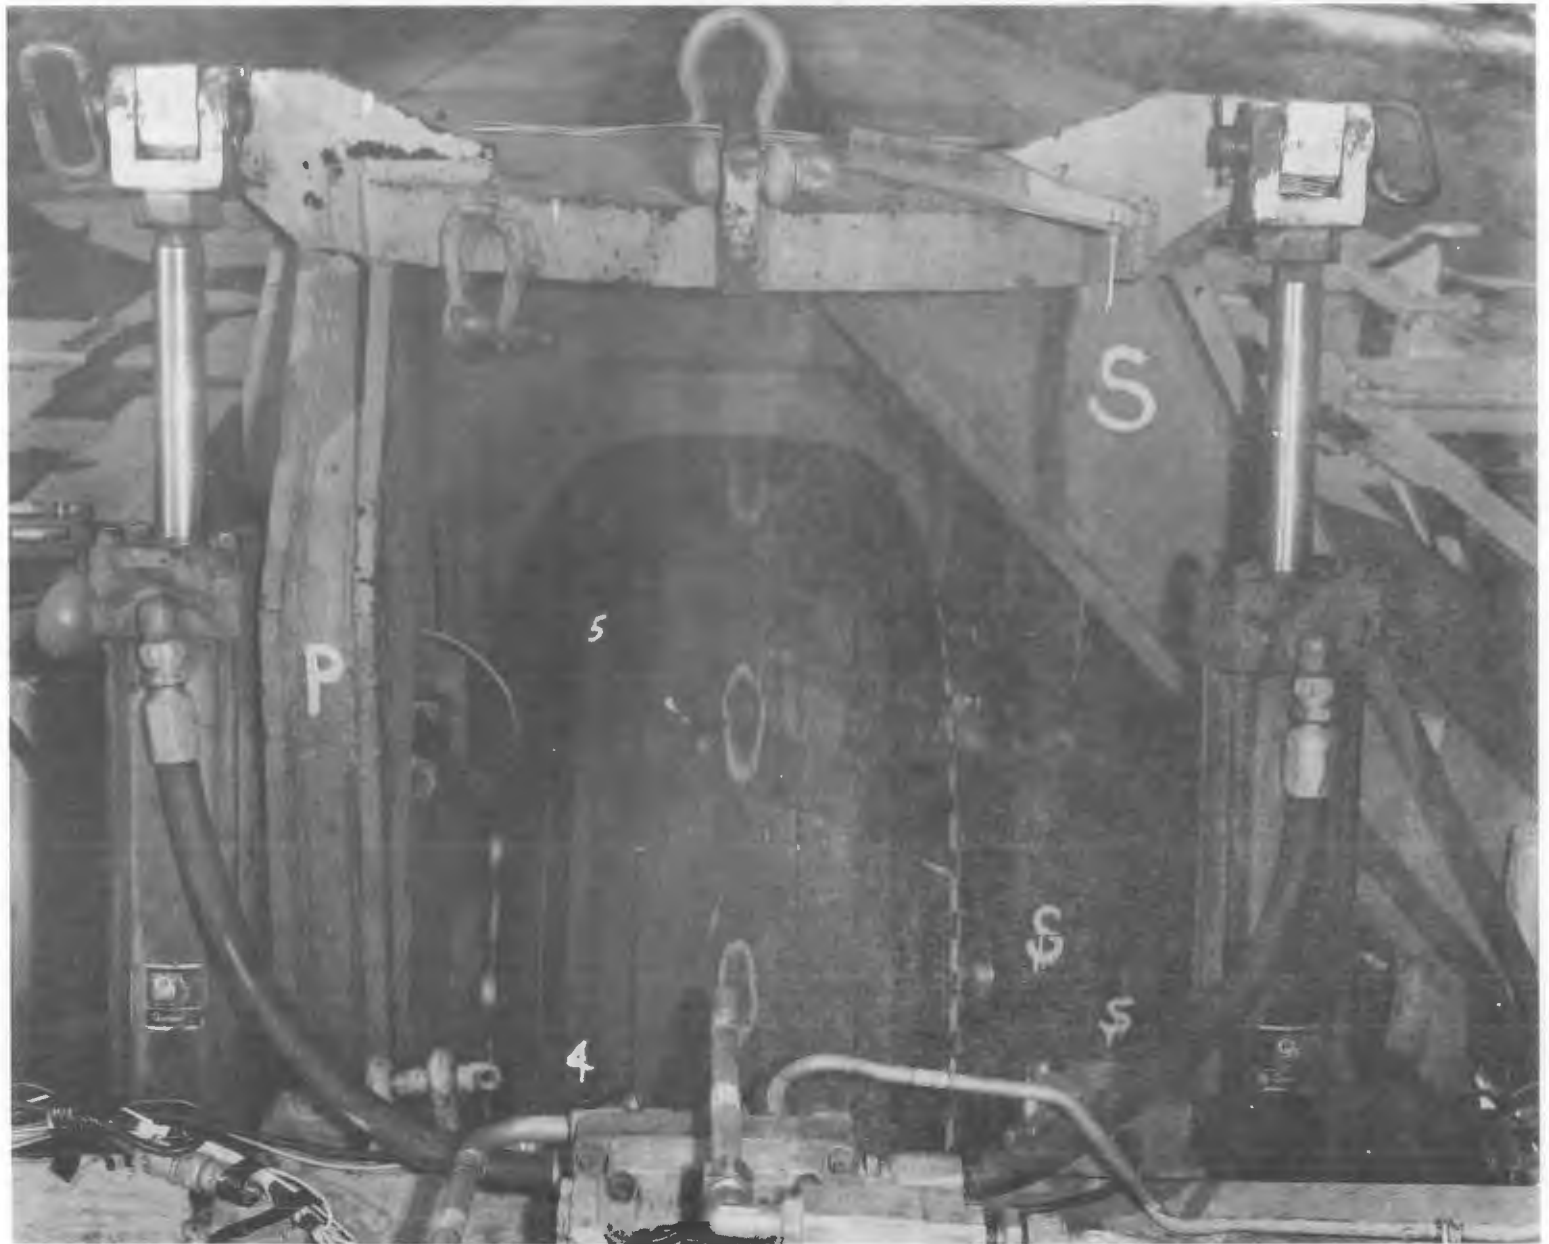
HYDRAULIC SYSTEM FOR APPLYING VERTICAL FORCE ON THE TEST SITE
